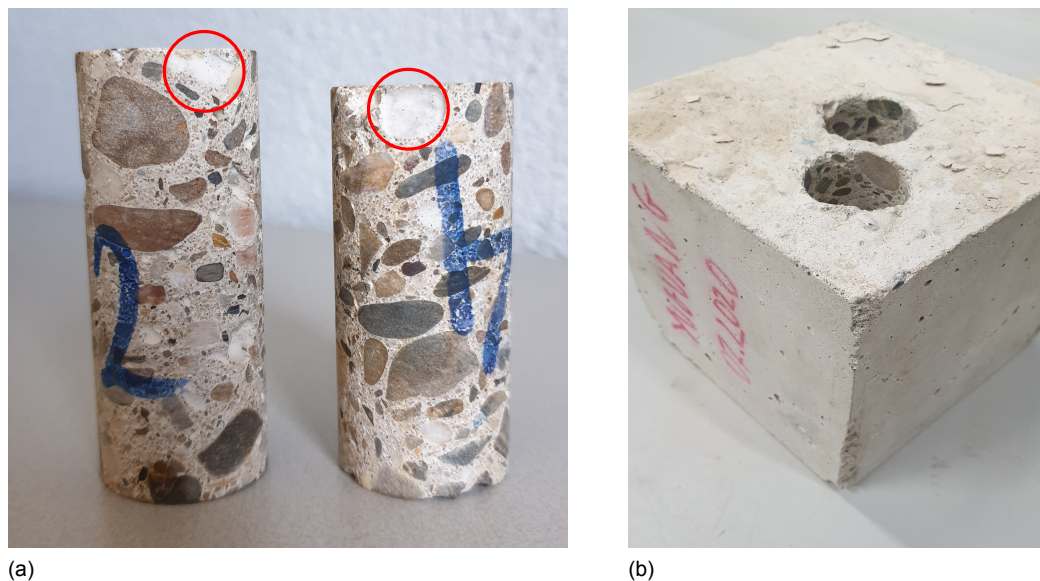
(a) Damaged concrete core specimens CC-2 and CC-4. (b) Concrete cube from which the concrete cores are drilled.
